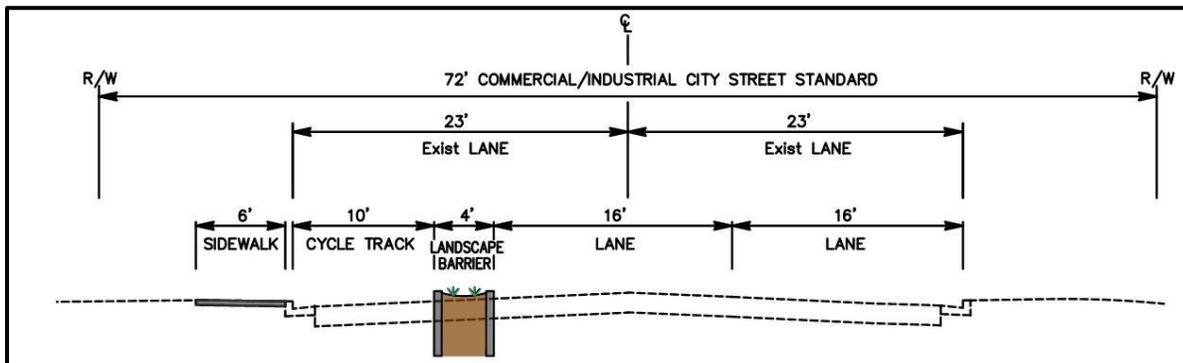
Alternate Brandin Court and Hannover Place Proposed Roadway Section
